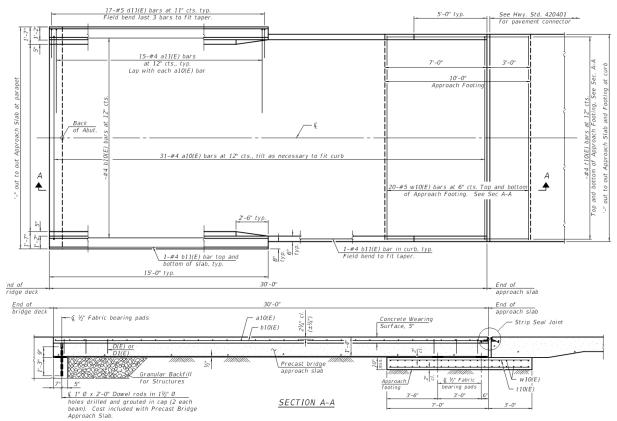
Plan and section views of approach slab with no skew (IDOT, 2017)
